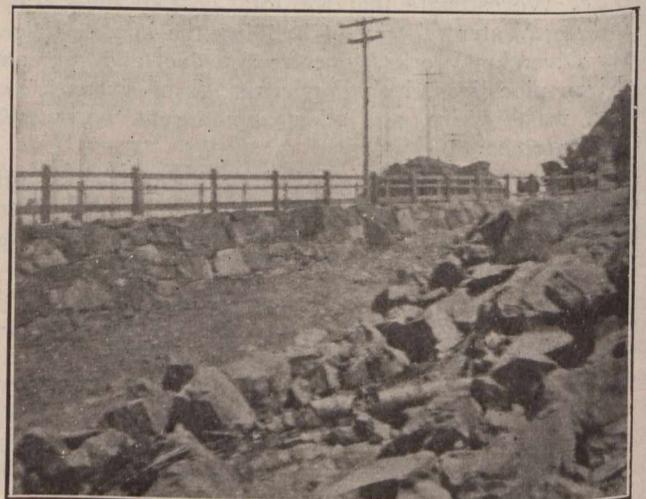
Section of Roadway Typical of Difficulties in the Construction of Northern Roads.
